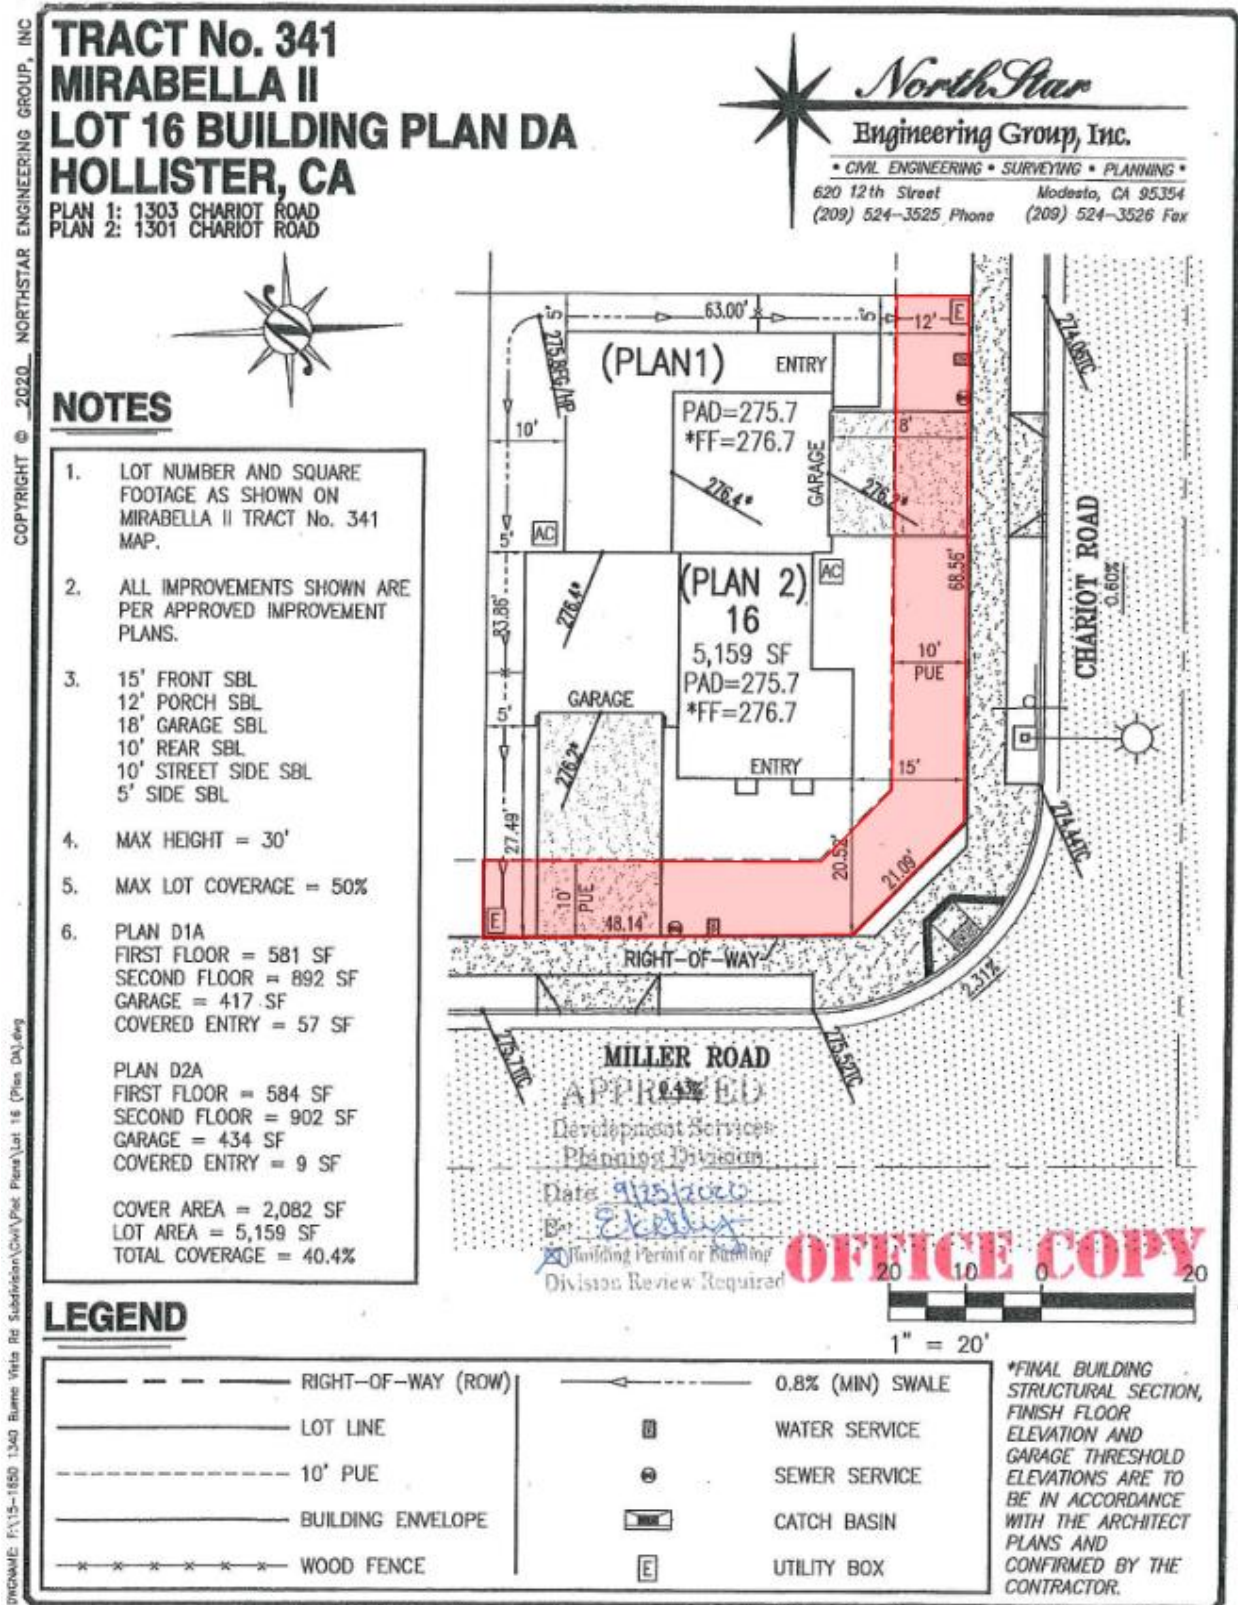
V: Plot Plan for 1301/1303 Chariot Road
